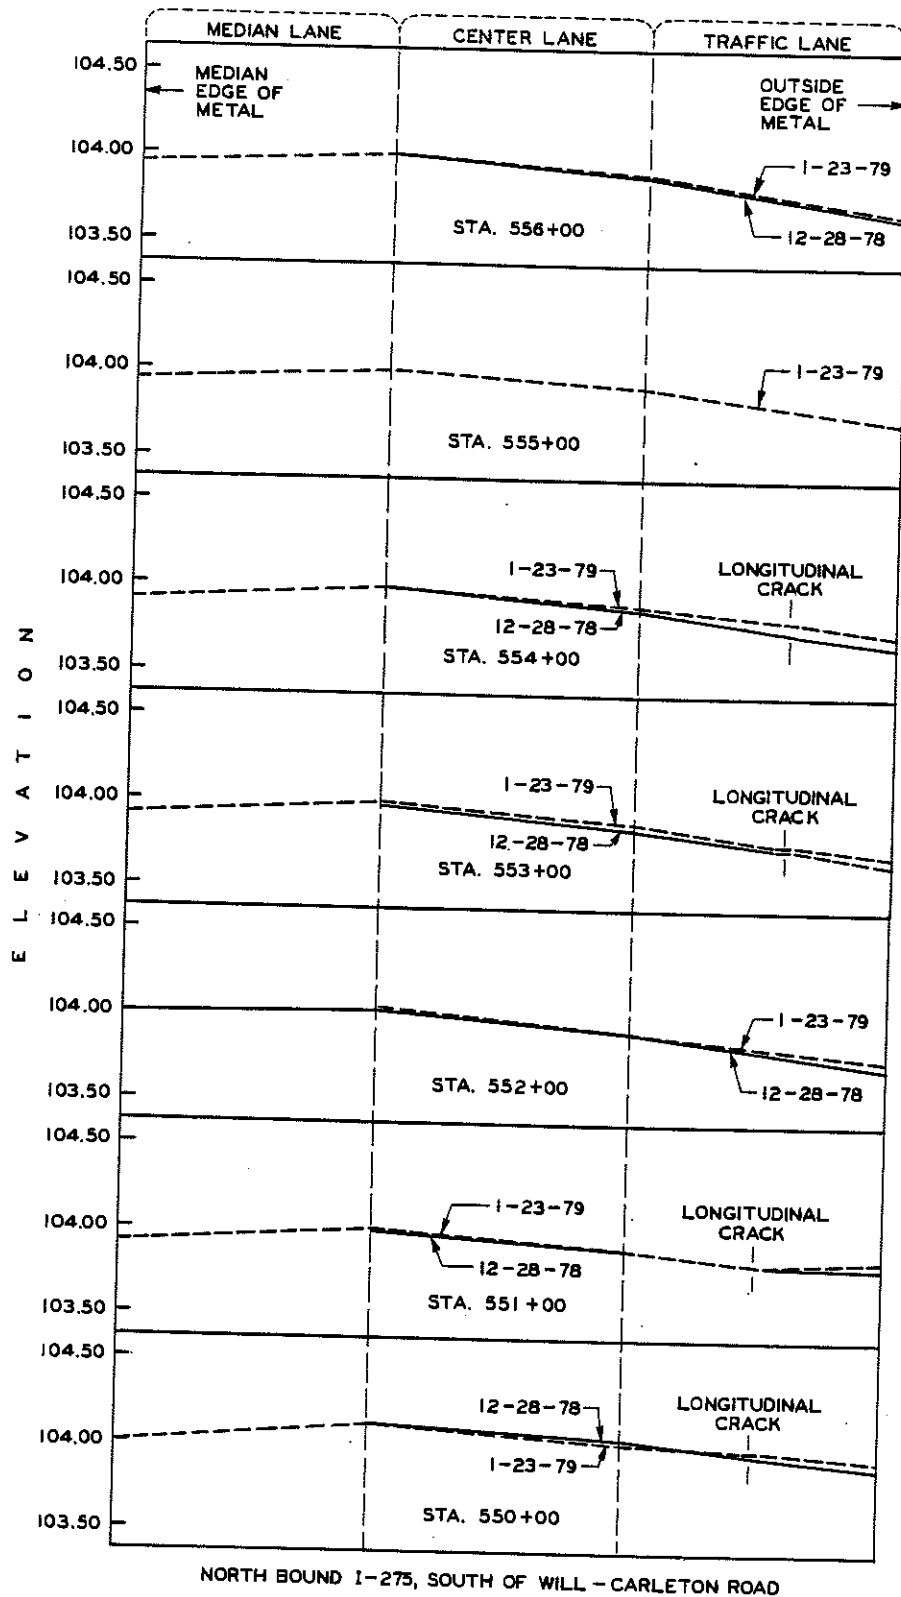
Transverse pavement profile at Sta. 552+00, 551+00, 550+00 indicating a tendency for the outside edge of metal to heave more than the rest of the pavement.
